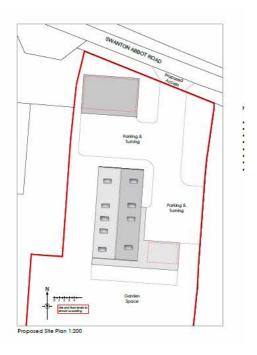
Excerpt from currently Proposed Planning Drawing Plans and Elevations, drawing number 21440, 02 G, by Vertex Architecture
